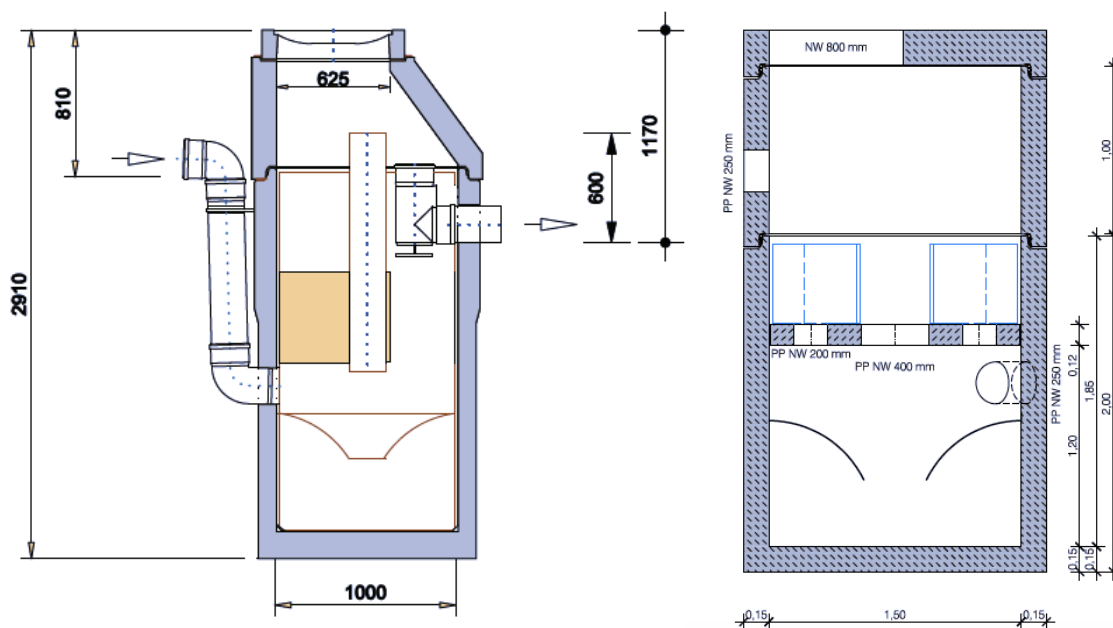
Typical setup of Hydrosystem DN 1000 and DN 1500 in concrete shafts
